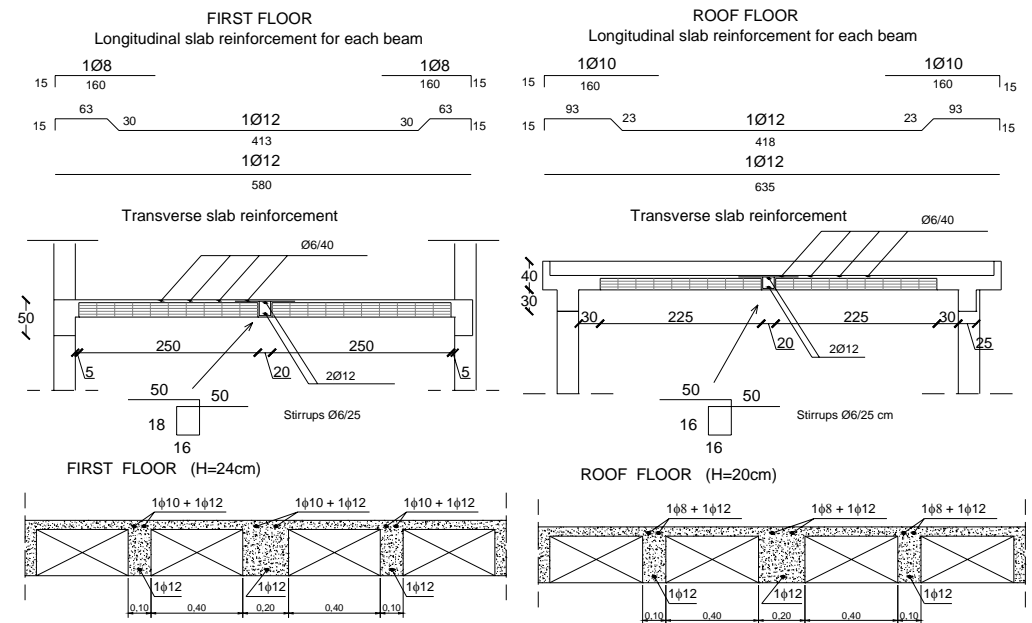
Steel reinforcement of the floor beams (length unit: cm)
